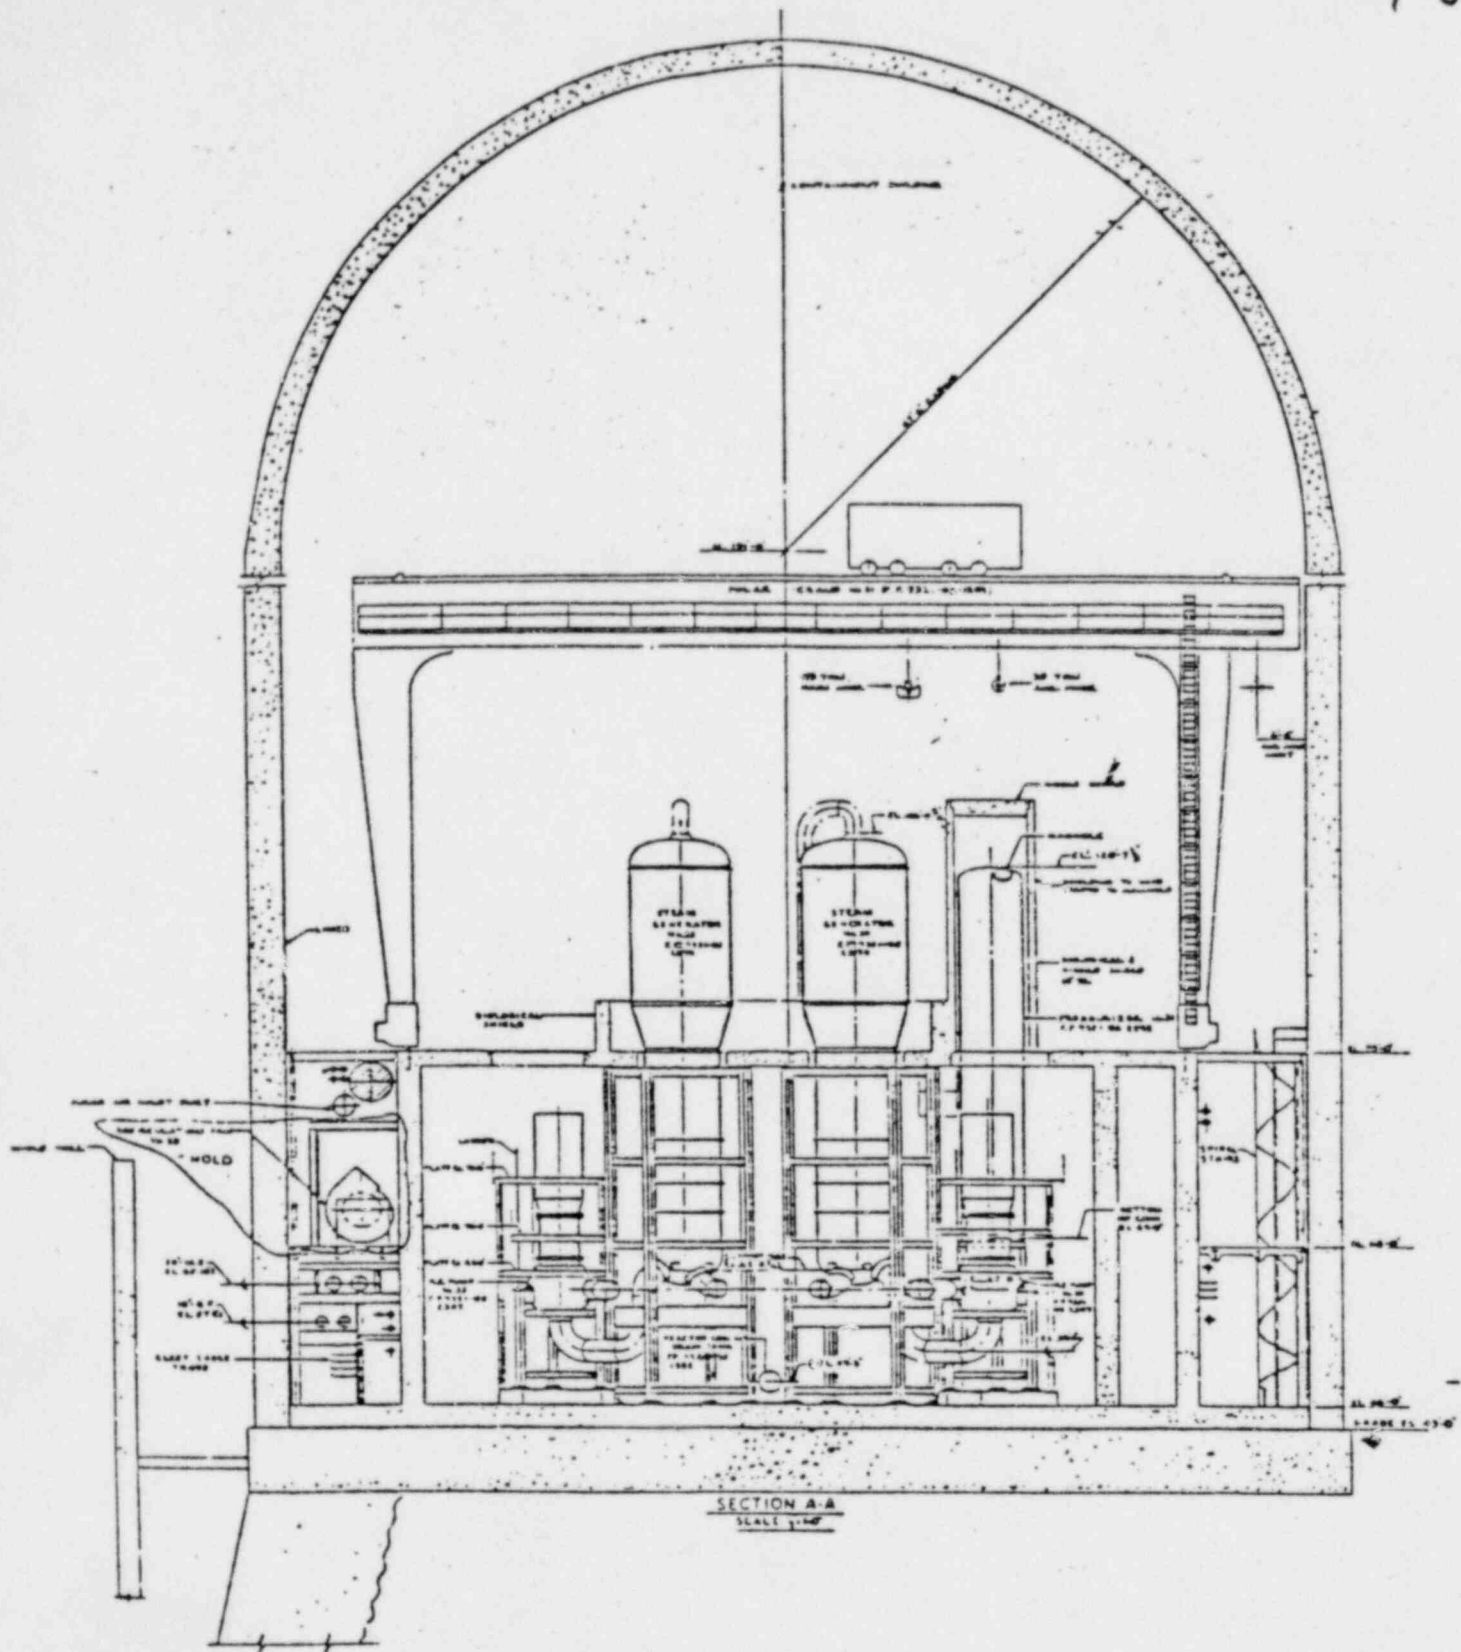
A. CROSS-SECTION OF THE CONTAINMENT BUILDING
